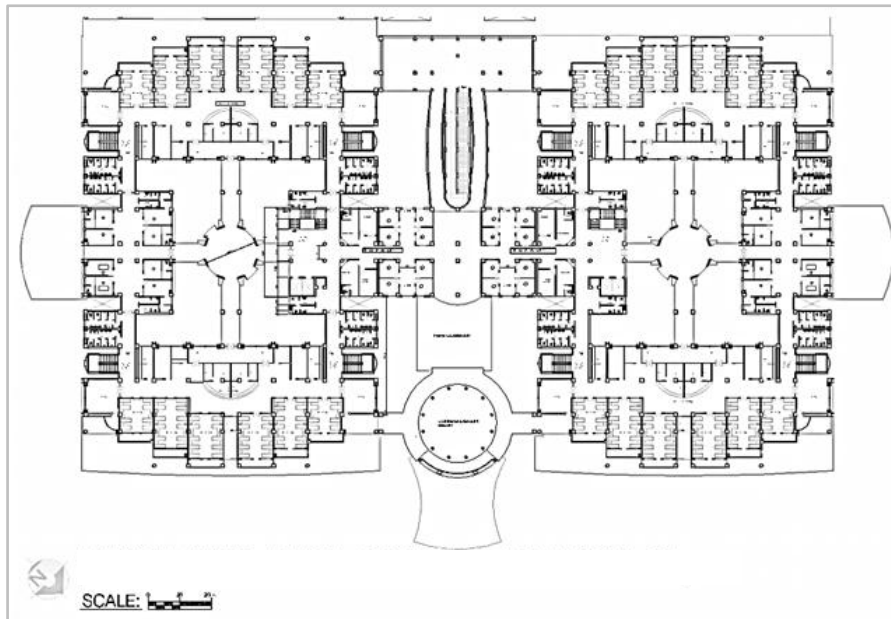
Typical floor plan Hospital 'G' (In-patient wards)
